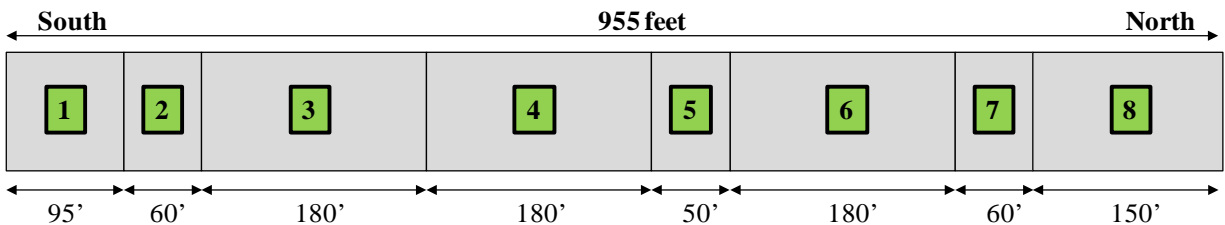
Treatment and monitoring plan for the barrier walls on the bridge structure (southbound lanes, similar layout for both the driving and passing lanes) over the Dog River near Montpelier, VT.
